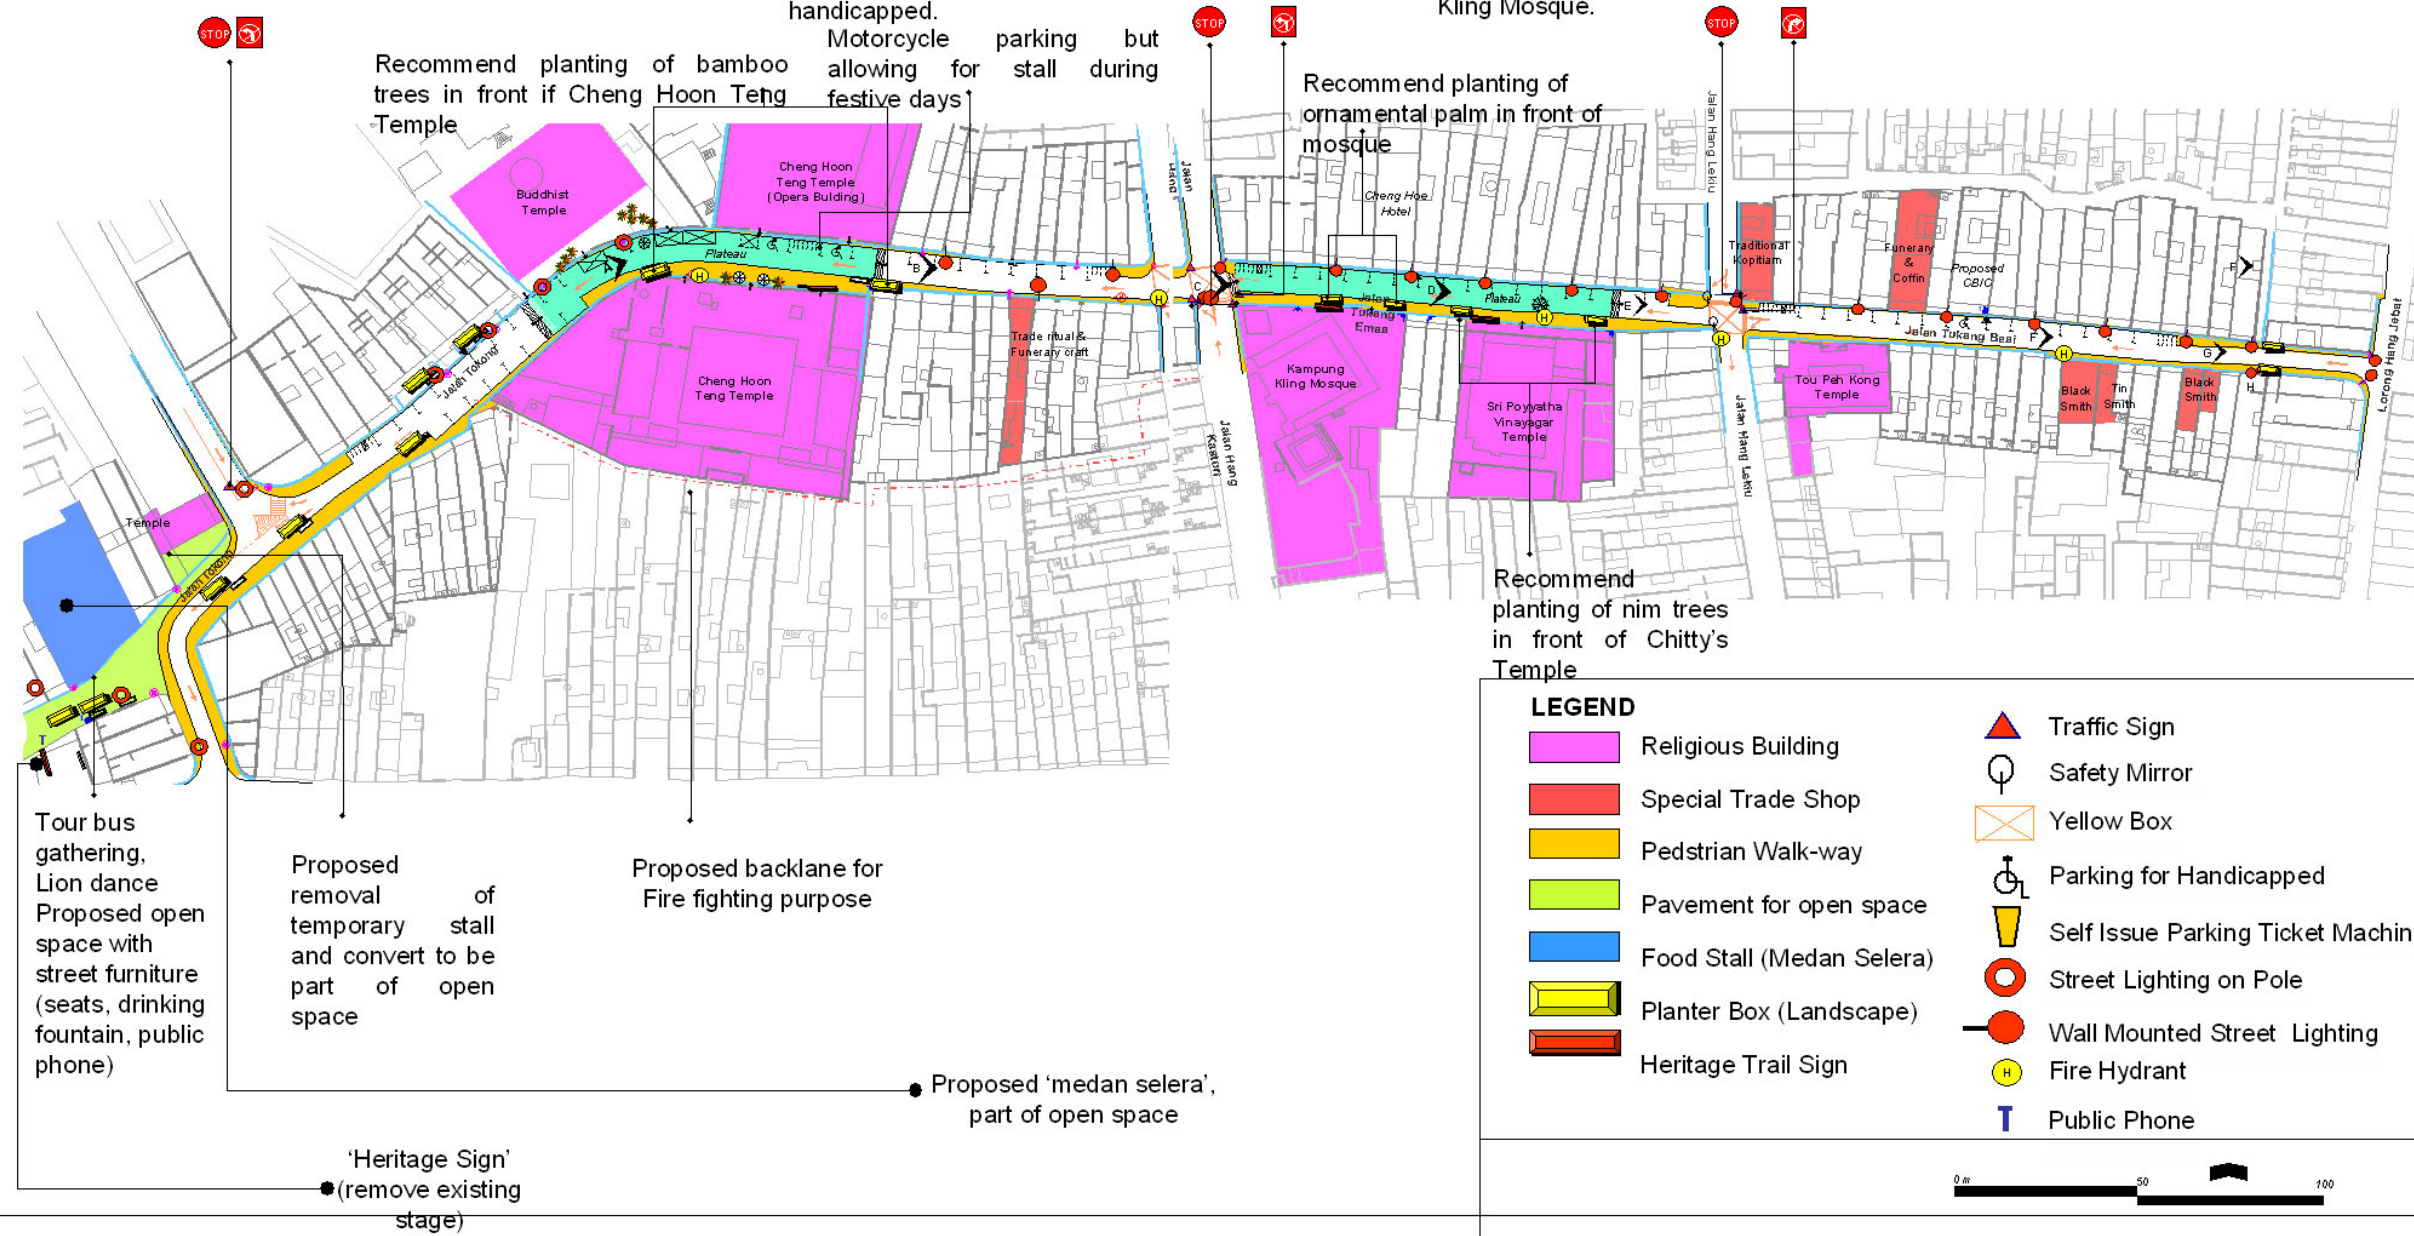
Proposed Improvements for Jalan Tokong, Jalan Tukang Emas and Jalan Tukang Besi
